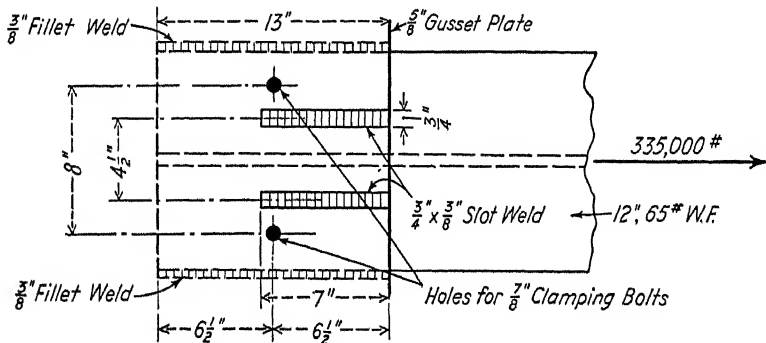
Fillet and Slot Welded Connection for Tension Member of I-Section.
